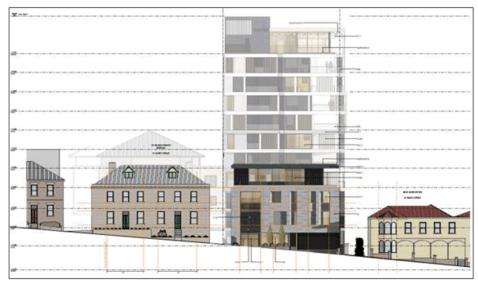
Elevation view montage along Davey Street (source: JAWS Architects)
